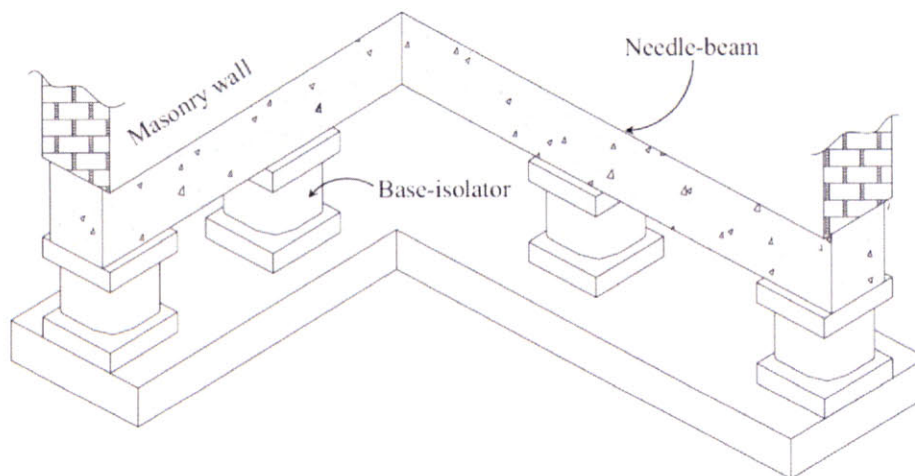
Details of base isolated masonry structure (Matsagar and Jangid, 2008)
